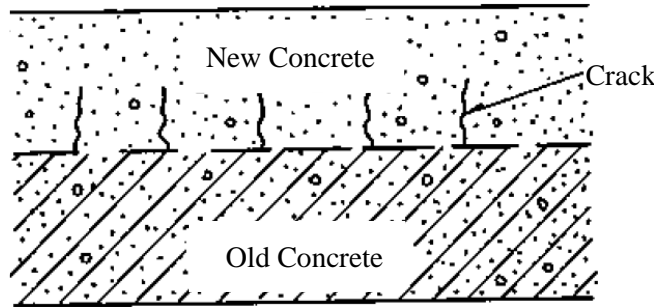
Example of Occurrence of Cracks due to Confining of Old Concrete
